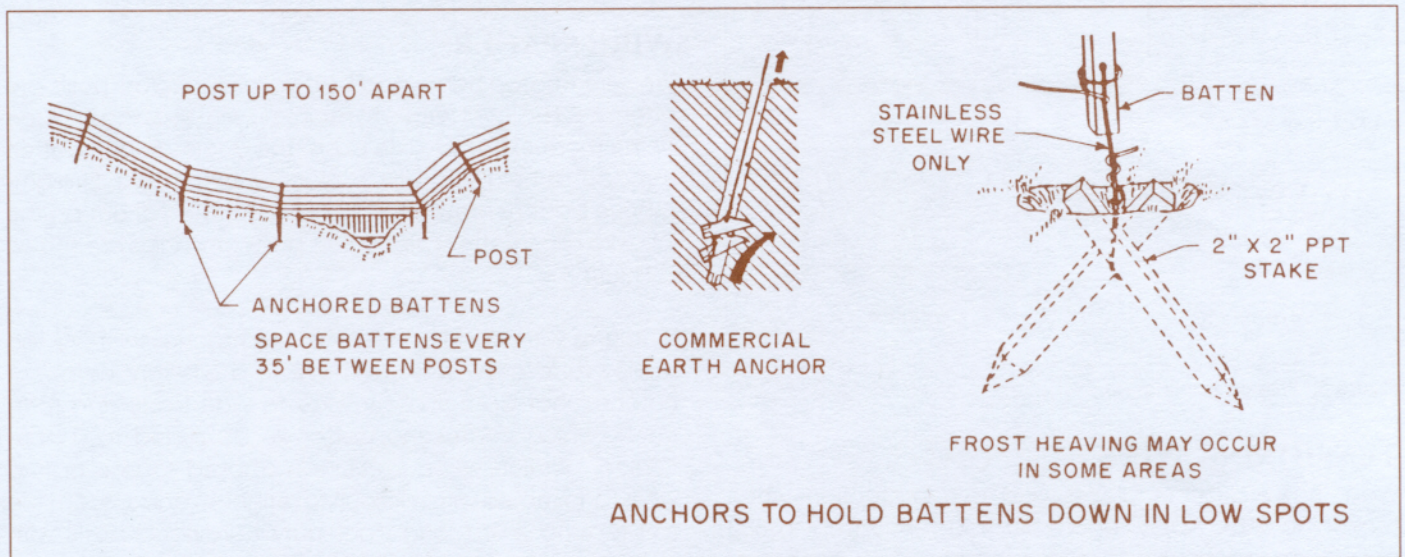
Batten Spacing and Anchoring for Uneven Ground
